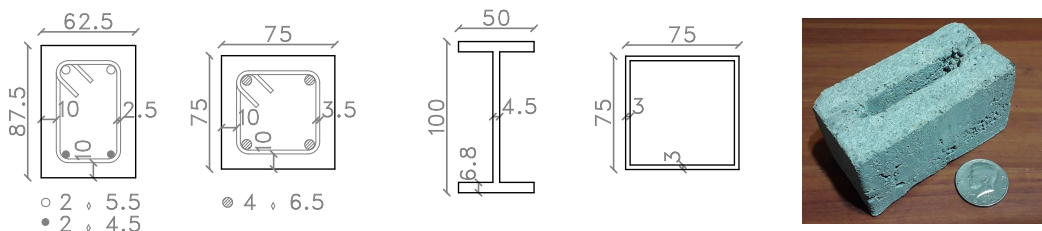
Geometric and building details of the concrete and steel beam and column sections, and masonry unit used in the specimens.
